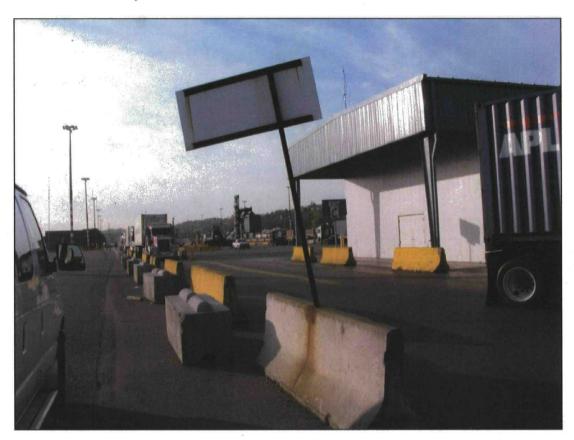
Photo shows the slab-on-grade building constructed on the 8-inch capped area in the central northeast portion of the site.
